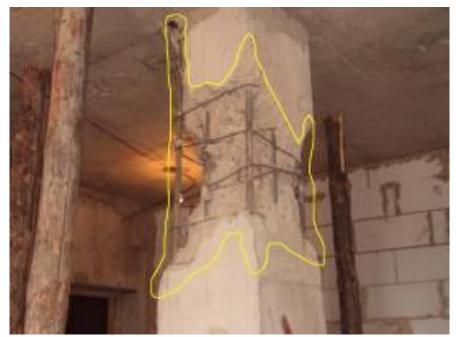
Column concrete failure with bare and corroded reinforcement
